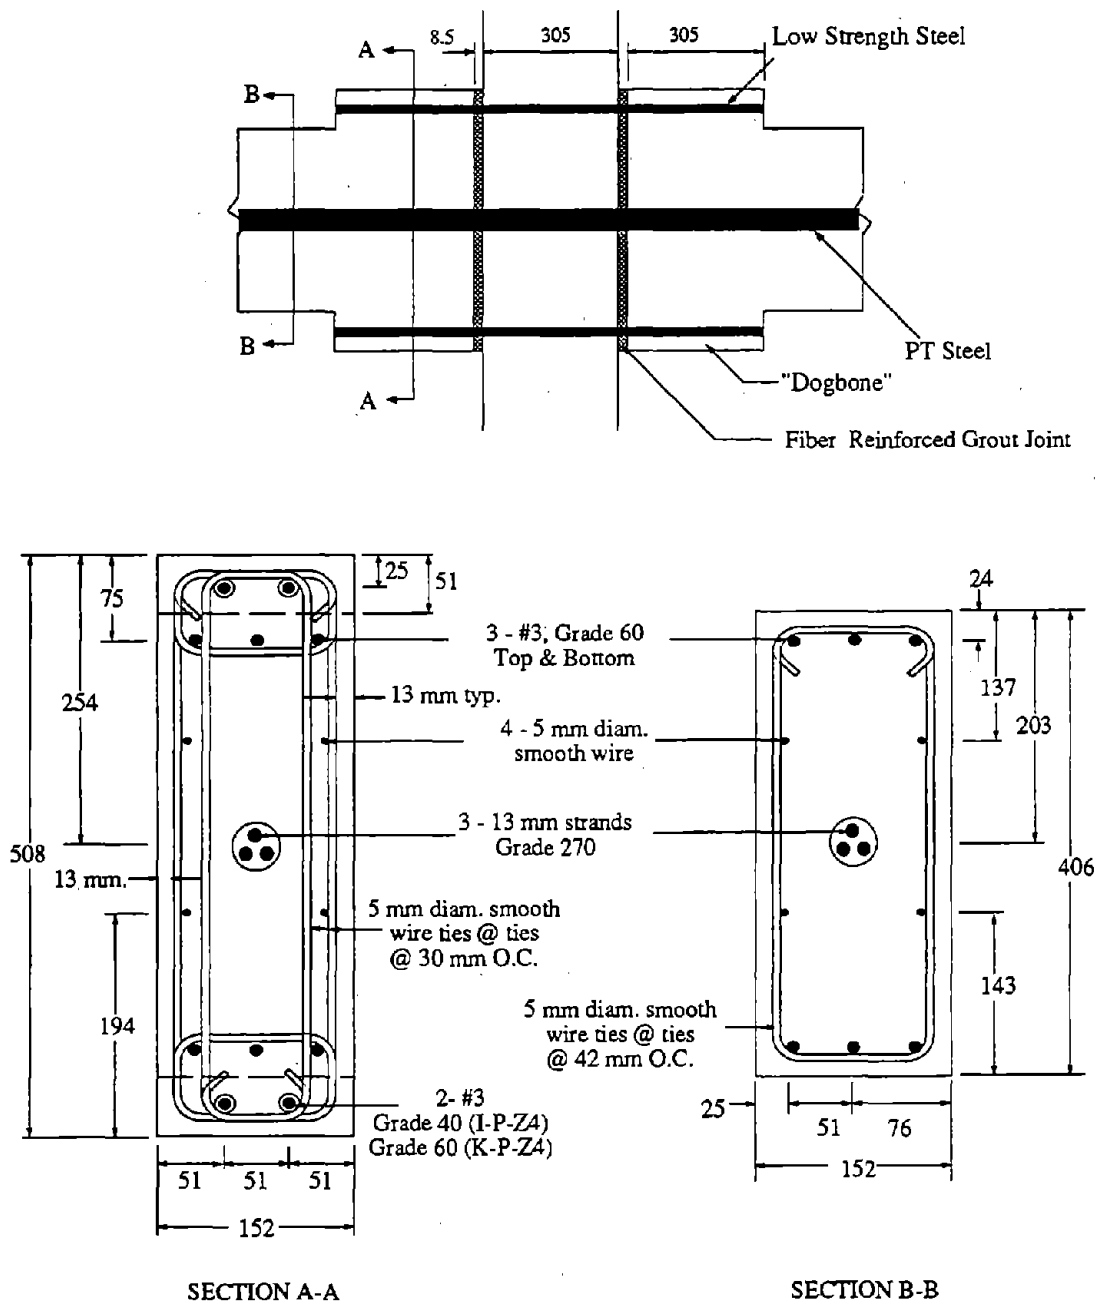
Model Beam Cross Sections for Phase IV A Specimens I-P-Z4 & K-P-Z4.
